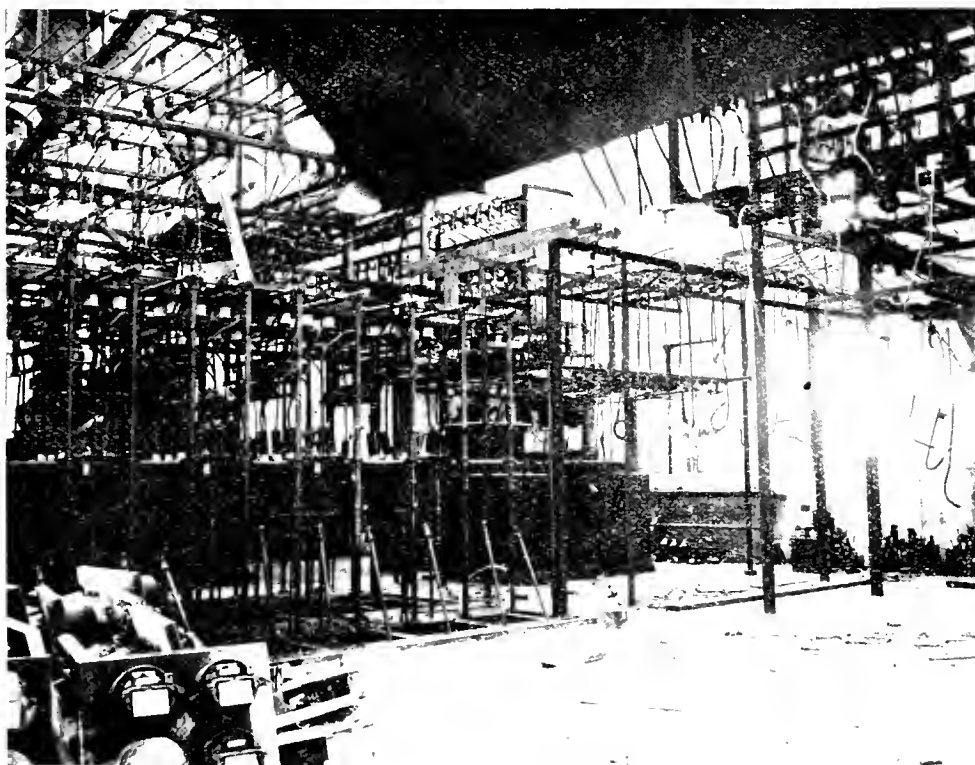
Ishizugawa substation-view showing location of damaged control board in front of damaged 3-KV switch gear
